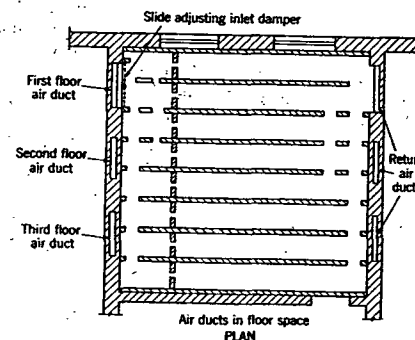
AIR DUCTS FOR FLOOR HEATING
